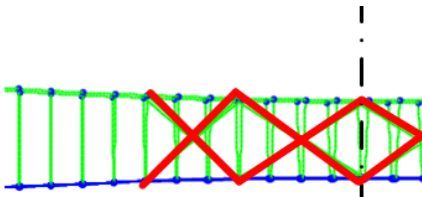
Vertical Bracing Pattern at Center of 70 m Span Footbridge
